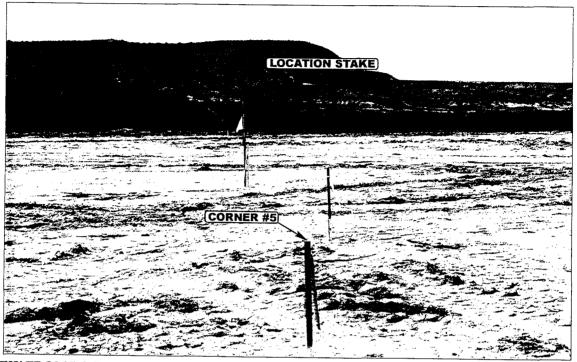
PHOTO: VIEW FROM LOCATION STAKE TO CORNER #5
